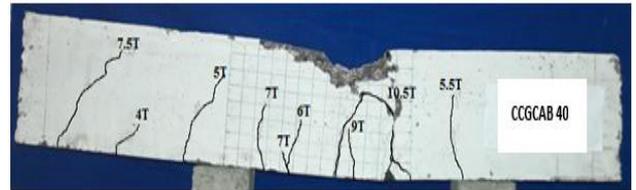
Failure Pattern of RWGCA Concrete Beam M 40 (CCGCAB)
